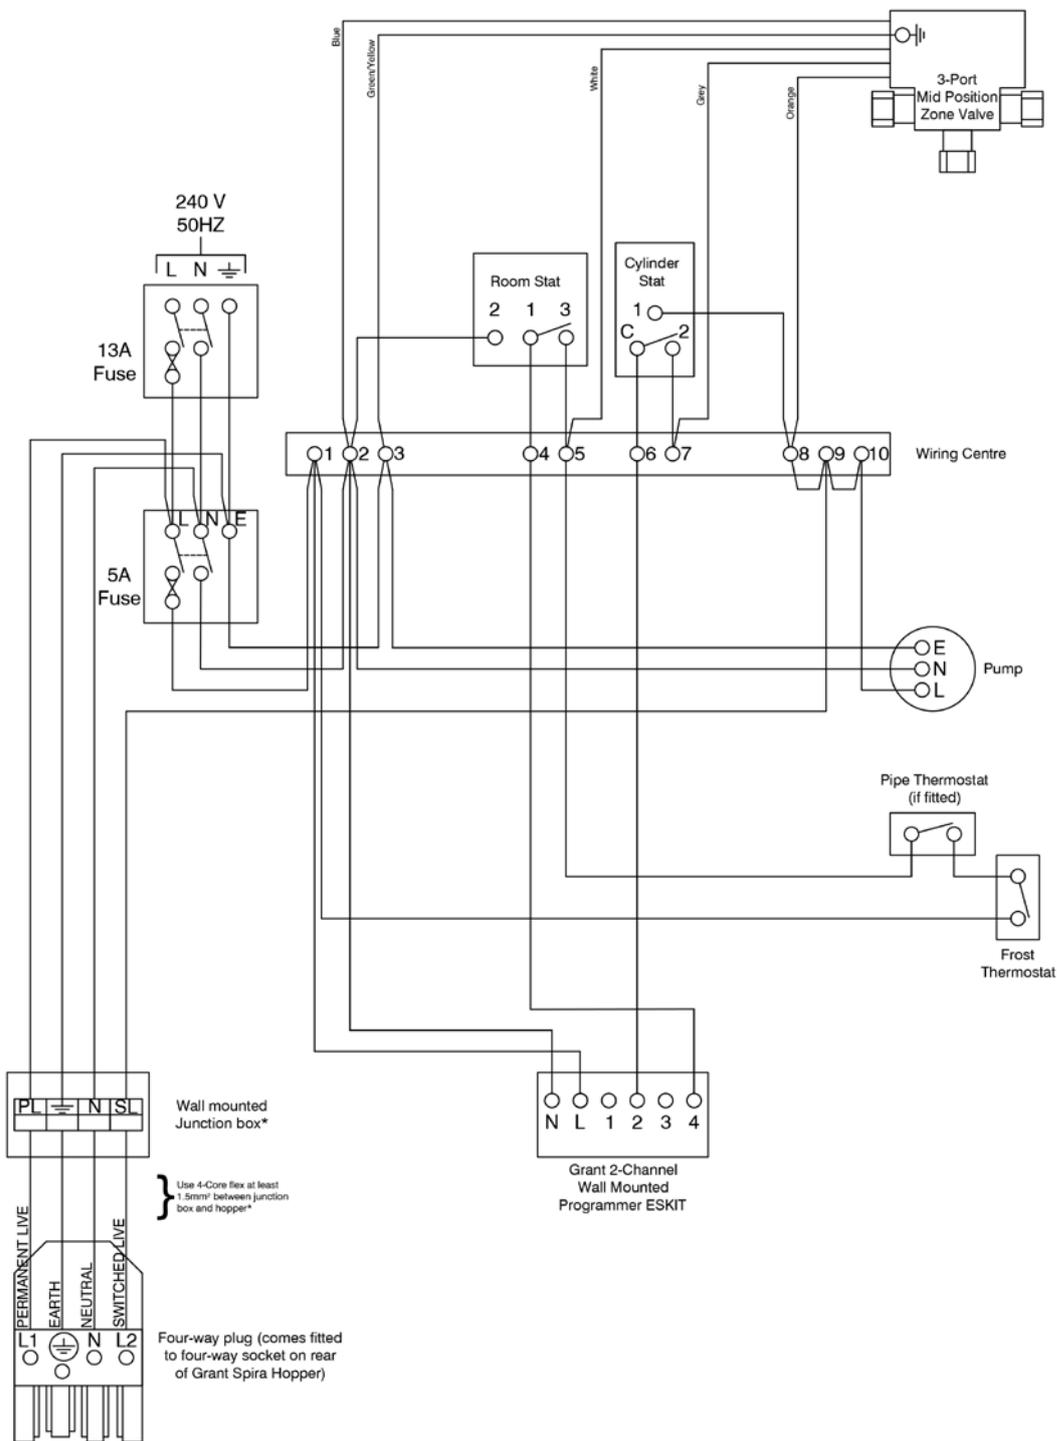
Heating system controls – Y-plan type system connection diagram.
